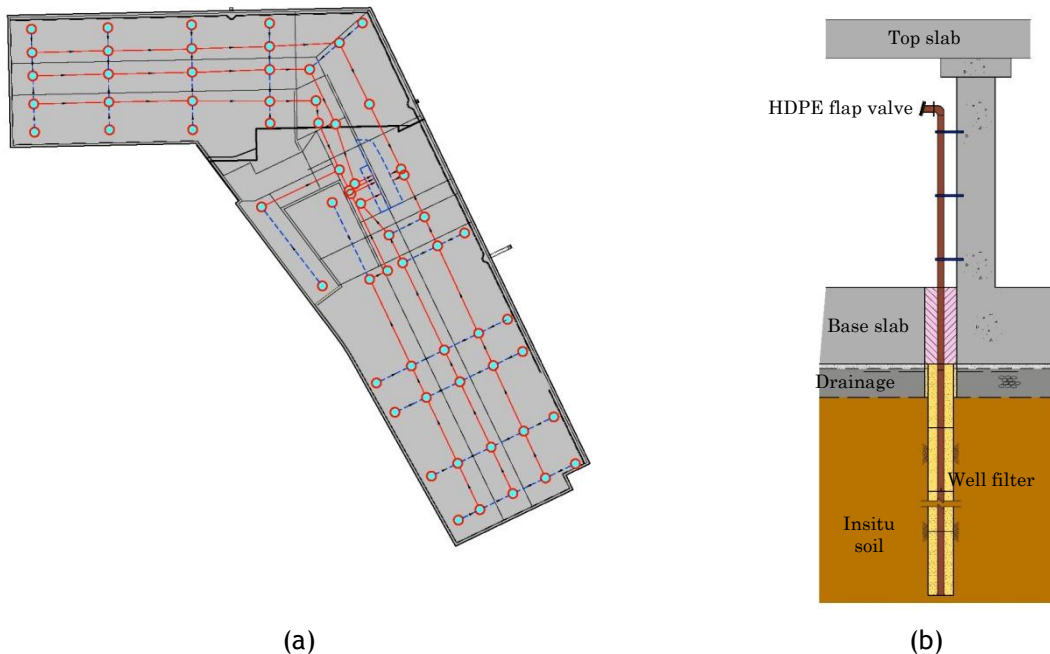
(a) Layout plan of sub-soil drainage system, (b) Indicative arrangement of relief wells
